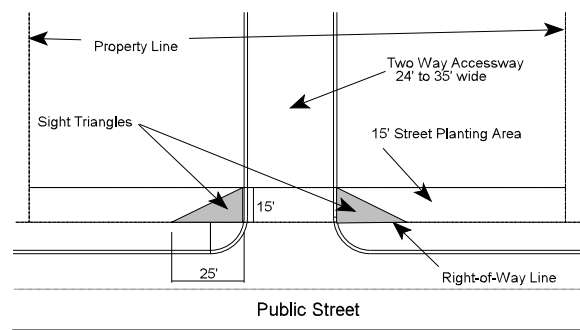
Sight Triangle for the Intersection of a Street and an Accessway (Private Drive)
